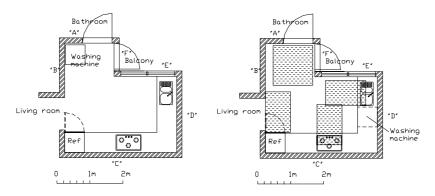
Floor layout analysis of Kitchen 9293-03.
